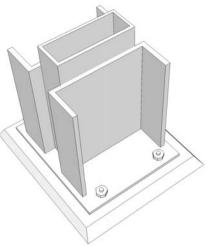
Steel column, rectangular hollow profile with two steel channels welded to opposite sides. [Source: author]
